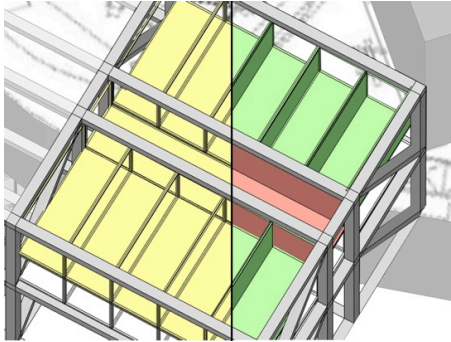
Two possible uses of the containerised modules: open and closed floor plan
